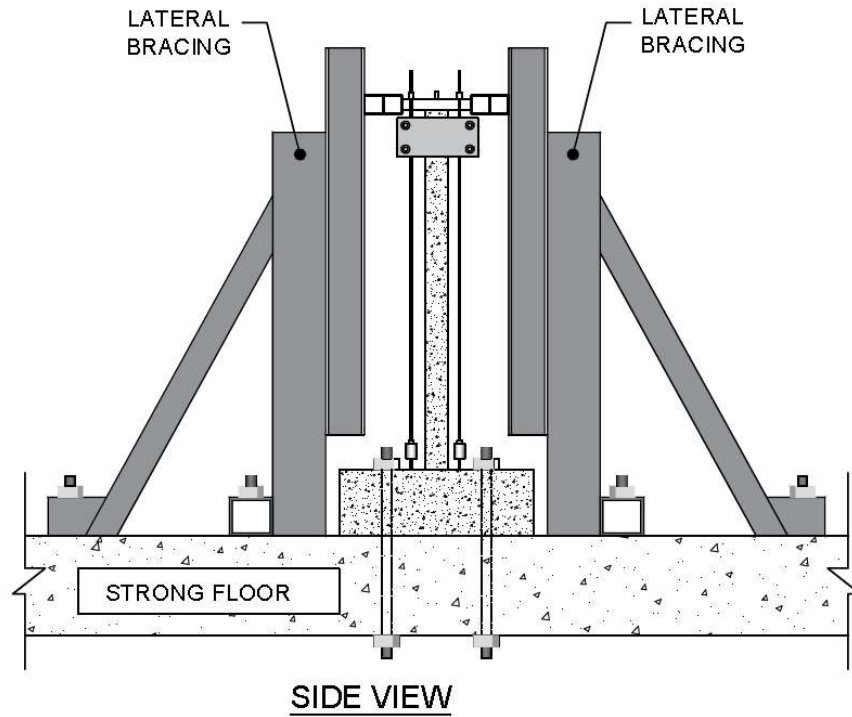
Proposed loading setup for Wall W2HS – side view
